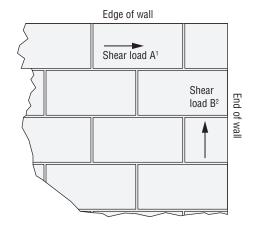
Direction of Shear Load in Relation to Edge and End of Wall
